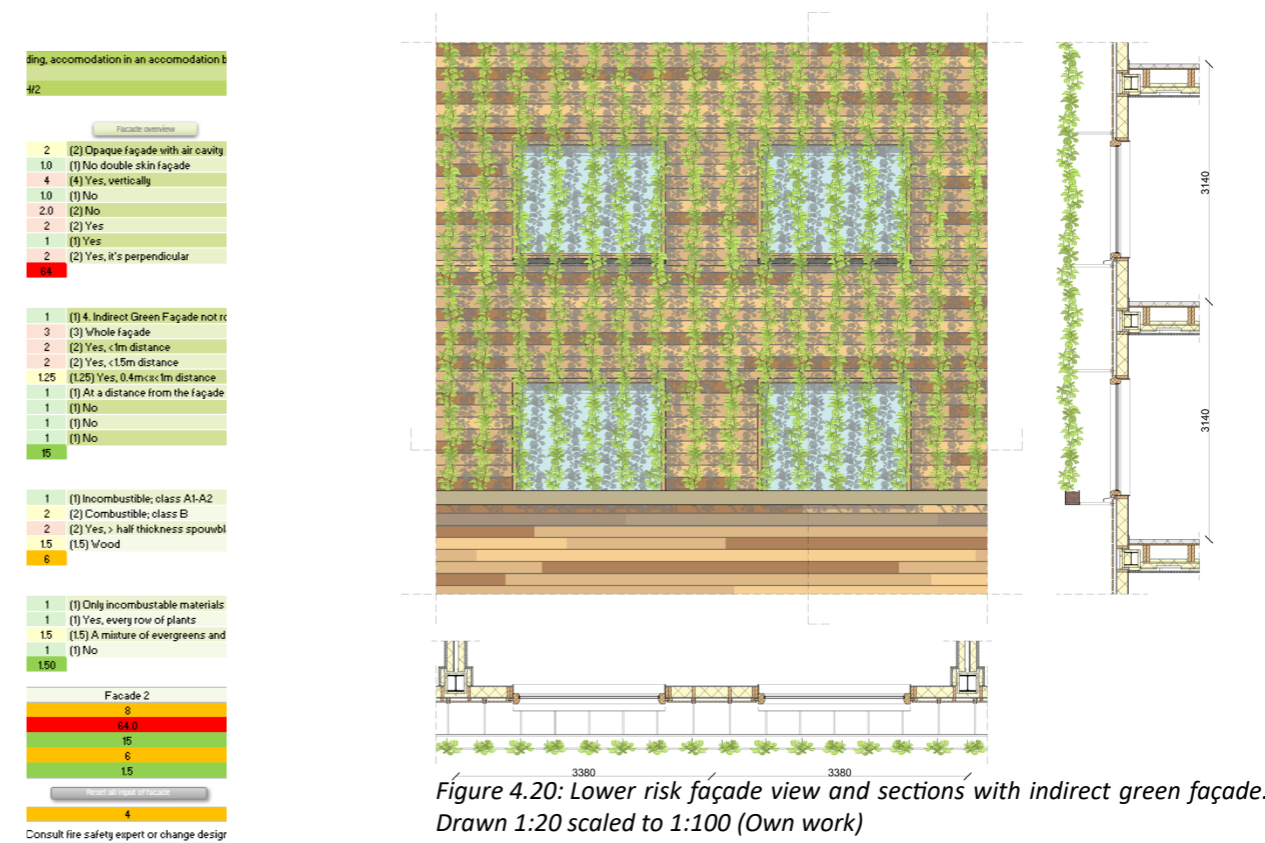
Lower risk façade view and sections with indirect green façade. Drawn 1:20 scaled to 1:100 (Own work)
